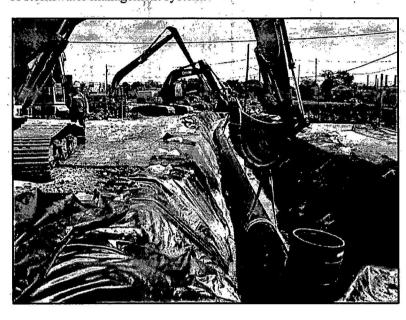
Installation of structural fill cover to final grades adjacent to the steel sheetpile wall.
